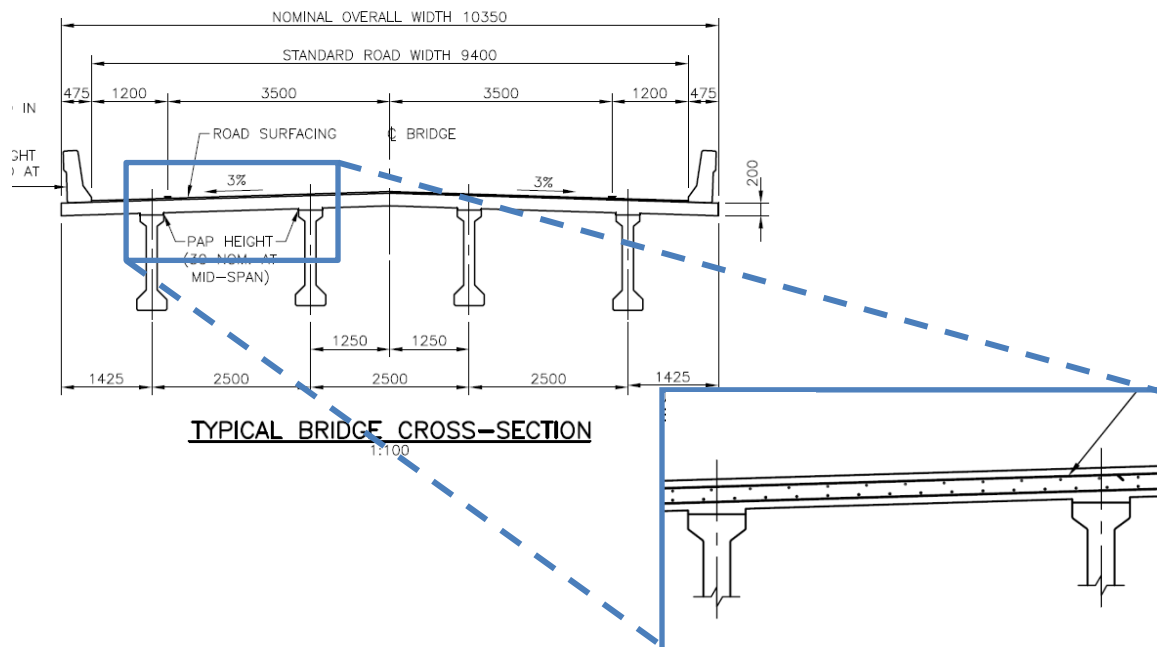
CONCEPT: Take existing design of steel reinforced bridge deck from NZTA Research Report 364, and modify with GFRP reinforcement. Cross-section of I beam bridge typology (NZTA, 2008); Close-up of cross- section showing position of longitudinal and transverse deck reinforcement.
